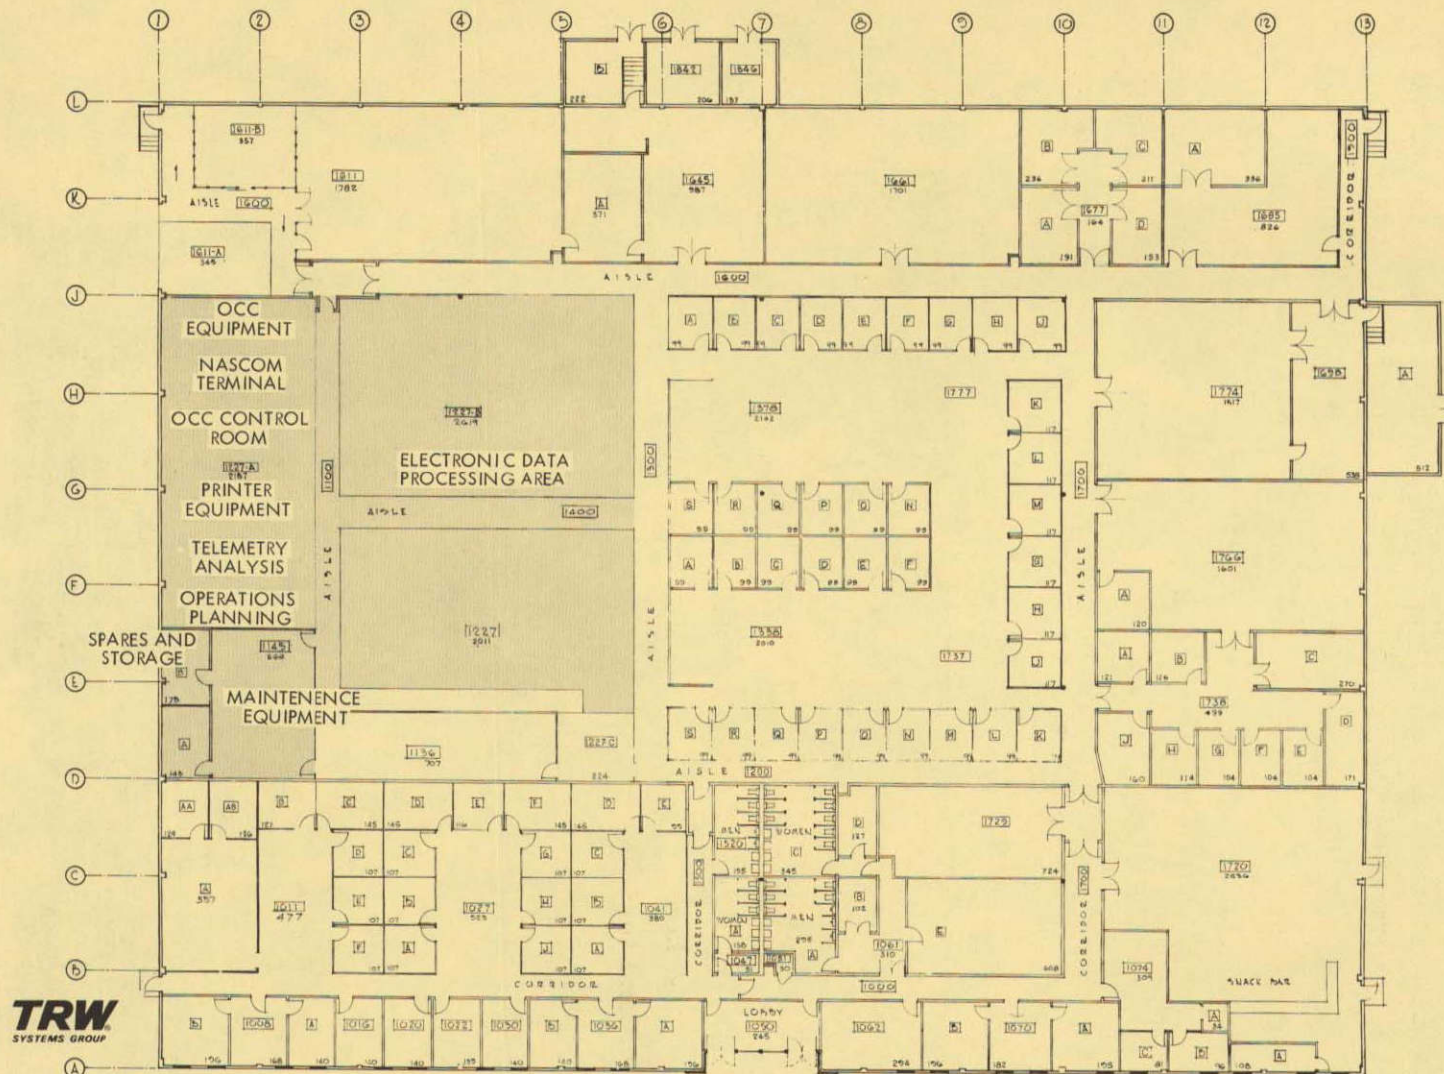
The shaded area in the floor plan of Building 74 is committed to integration and test of the OCC
